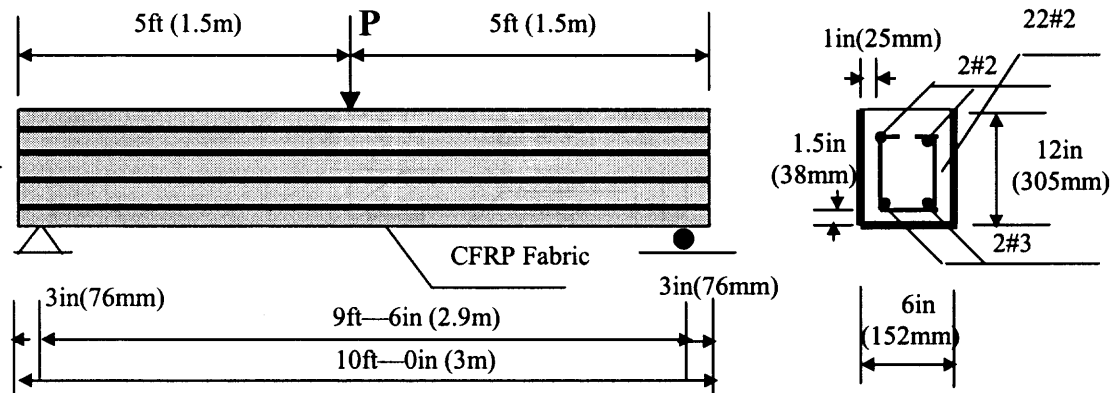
Specimen details of beams CJ2 and CJ3.
